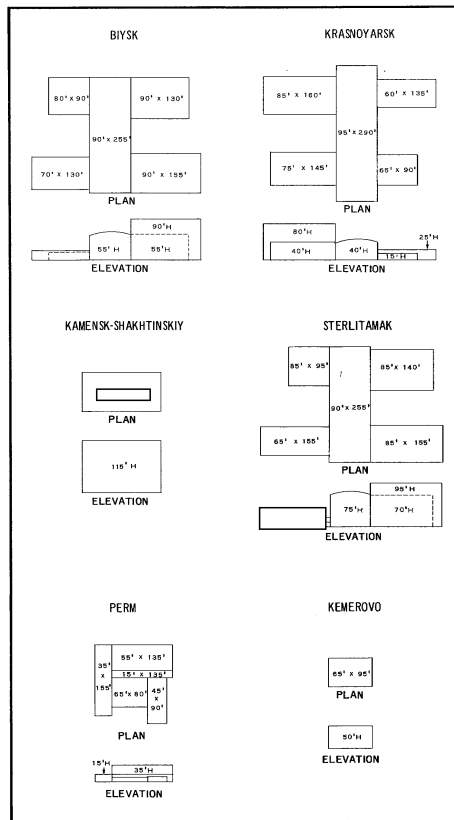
PLAN DRAWINGS, ELEVATIONS, AND DIMENSIONS OF PROBABLE ASSEMBLY/CHECKOUT BUILDINGS.
